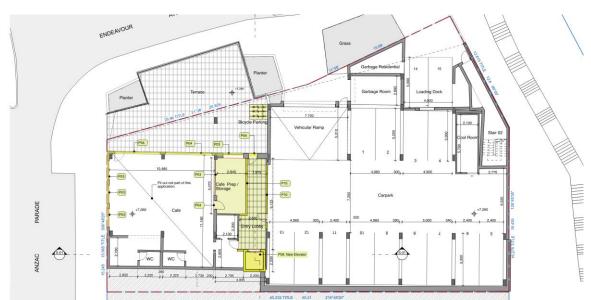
Proposed Ground Floor Level - 1605 Anzac Parade
